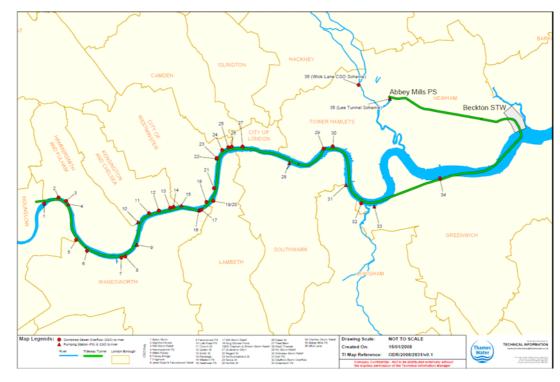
Proposed Tideway Tunnel Route and Connected Combined Sewer Overflow
